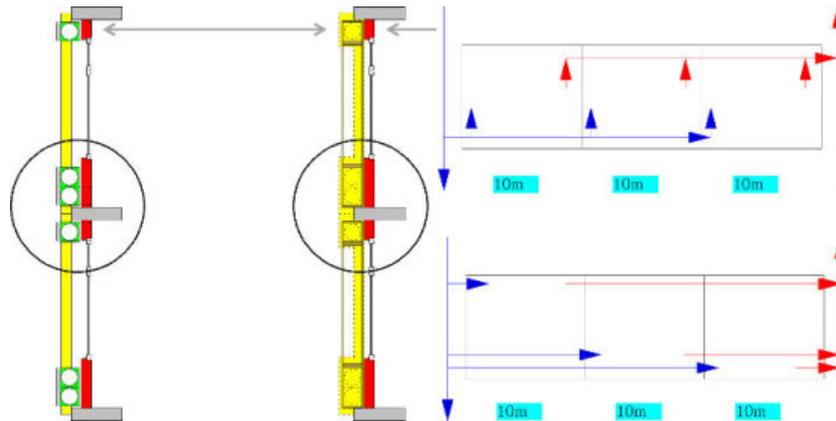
Central ventilation with horizontal air distribution and smaller effect on architecture; Left: Cross section of two façade-Storeys; Right: Elevation of two façade-storeys with horizontal ductwork
